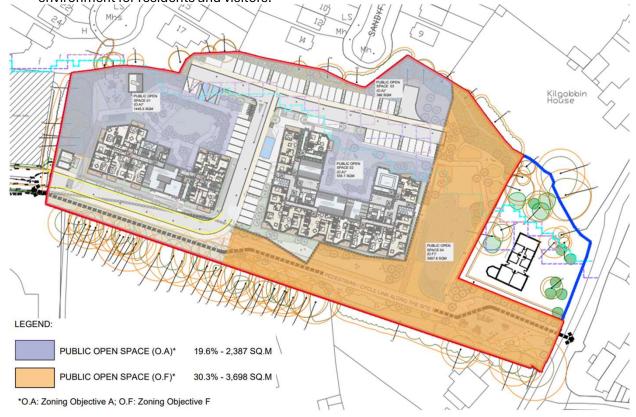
Proposed Site Plan with Ground Floor – Public Open Space Areas
